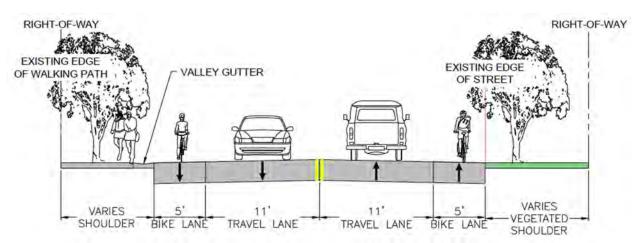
Ringwood Avenue Existing Cross Section (Menlo Oaks) Looking North Toward Bay Road
